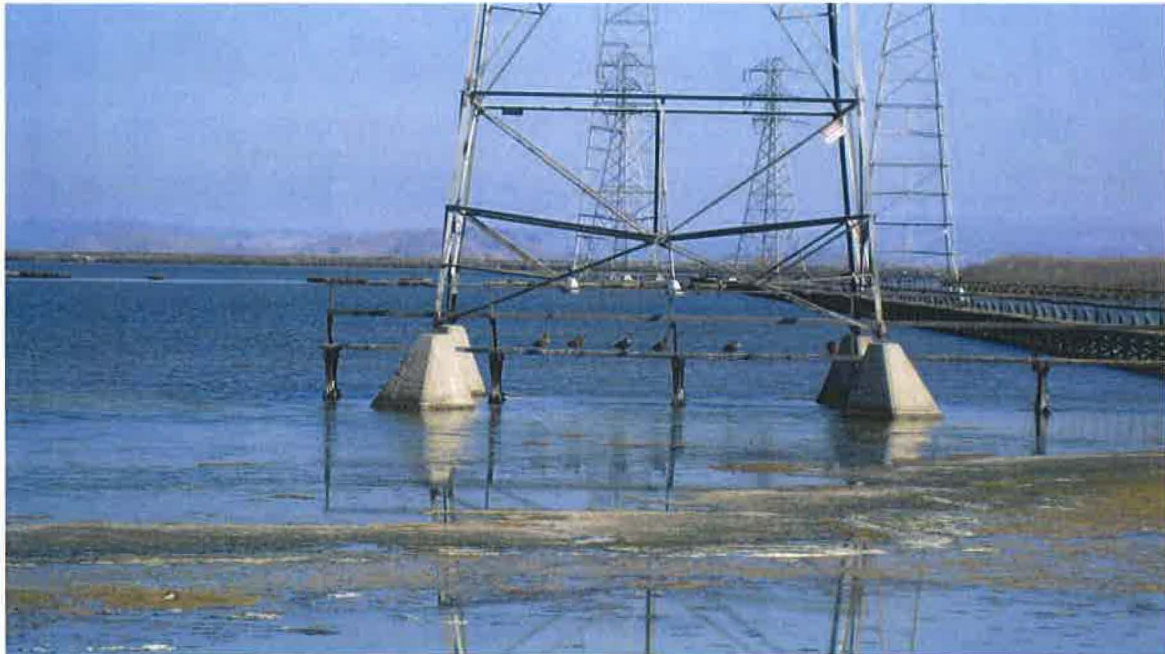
Existing PG&E infrastructure (boardwalks and towers) in Pond A2W (Salt Pond Jurisdiction).
